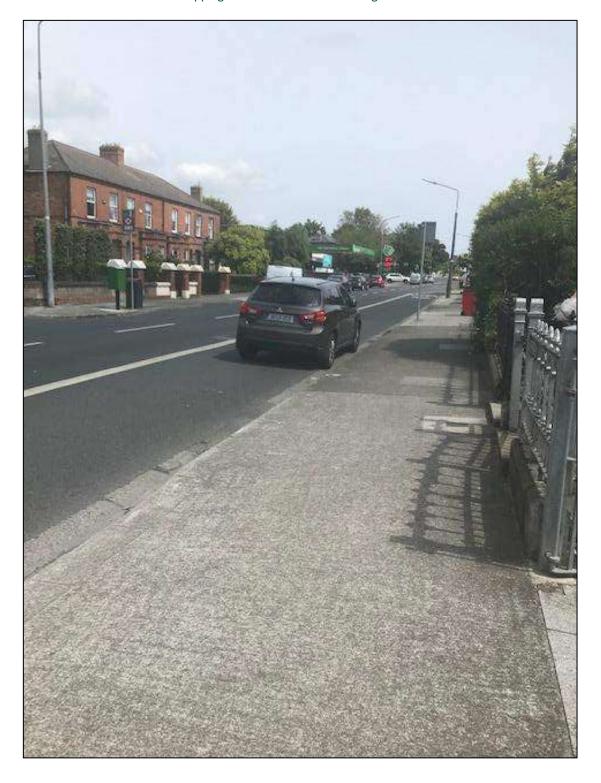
Abundant services on concrete footpath adjacent to cable route on Howth Road.
